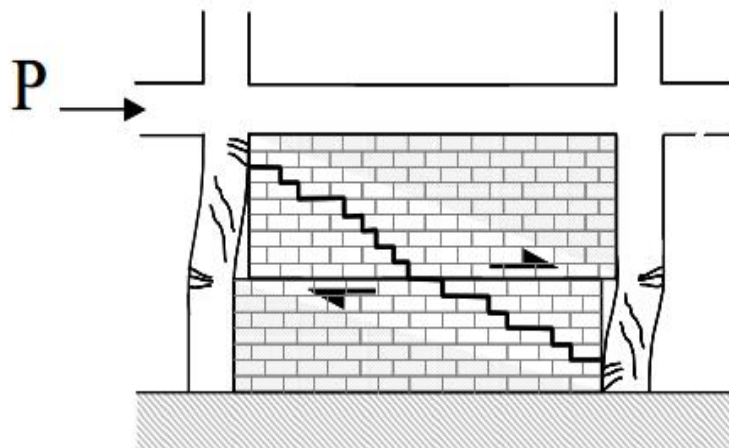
Shear failure of masonry(Ghassan Al-Chaar).
